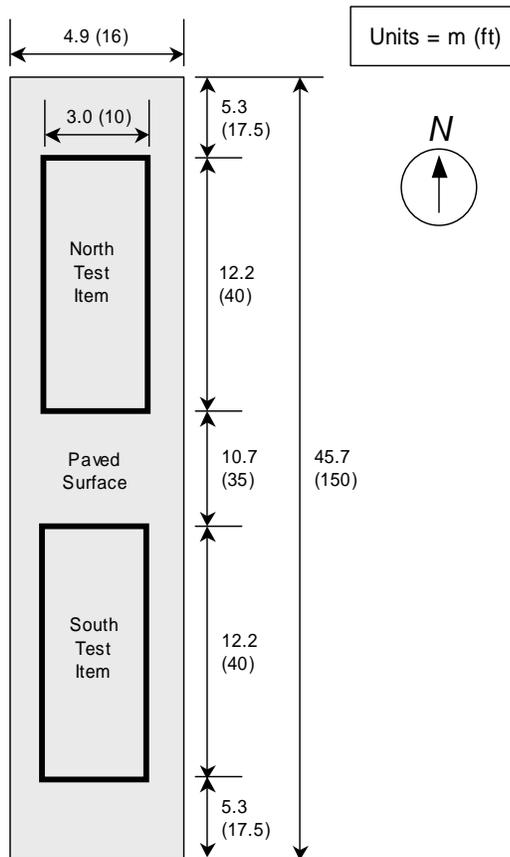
Layout of the Heavy-Duty Pavement Test Section
